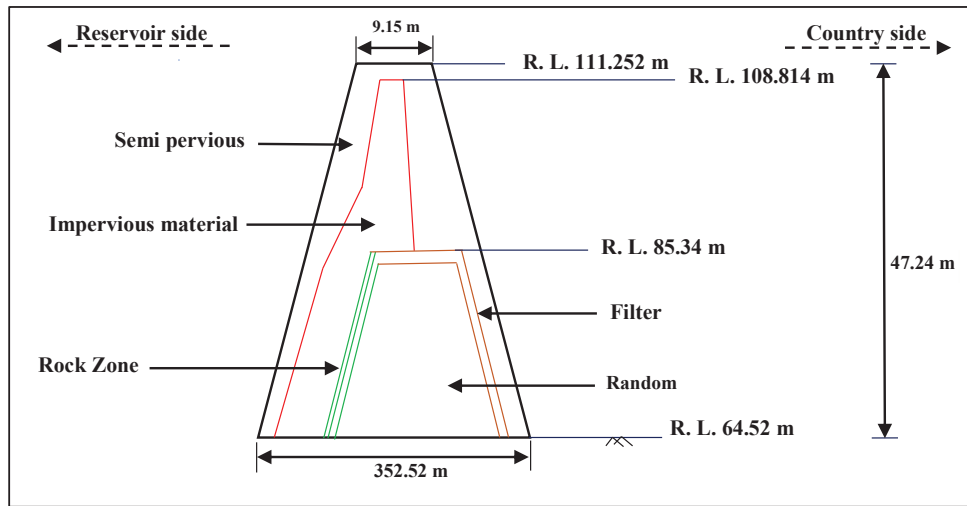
Cross-section showing material within right bank earth dam- Ukai project (not to scale)
